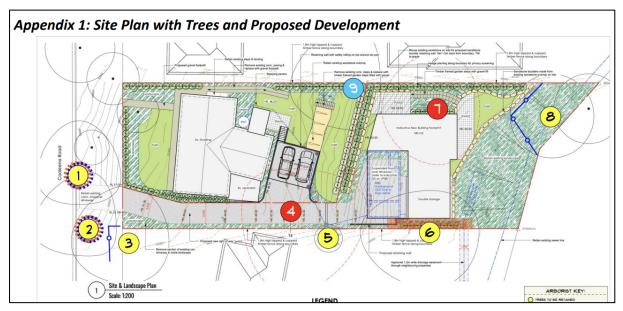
Proposed tree removal plan overlaid on plan showing future dwelling footprint.
